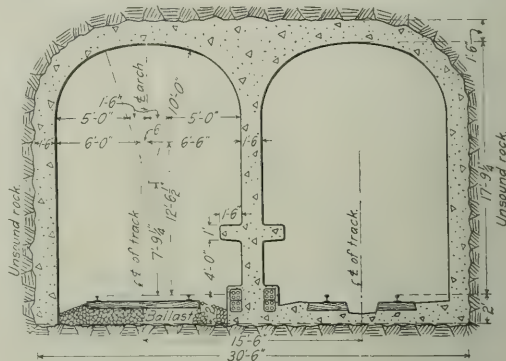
Typical Sections of Concrete Tunnel Lining.
